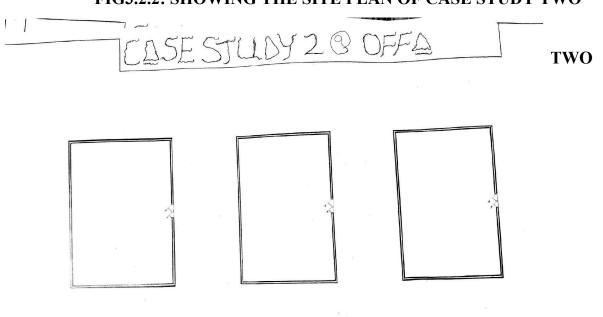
SHOWING THE SITE PLAN OF CASE STUDY TWO
